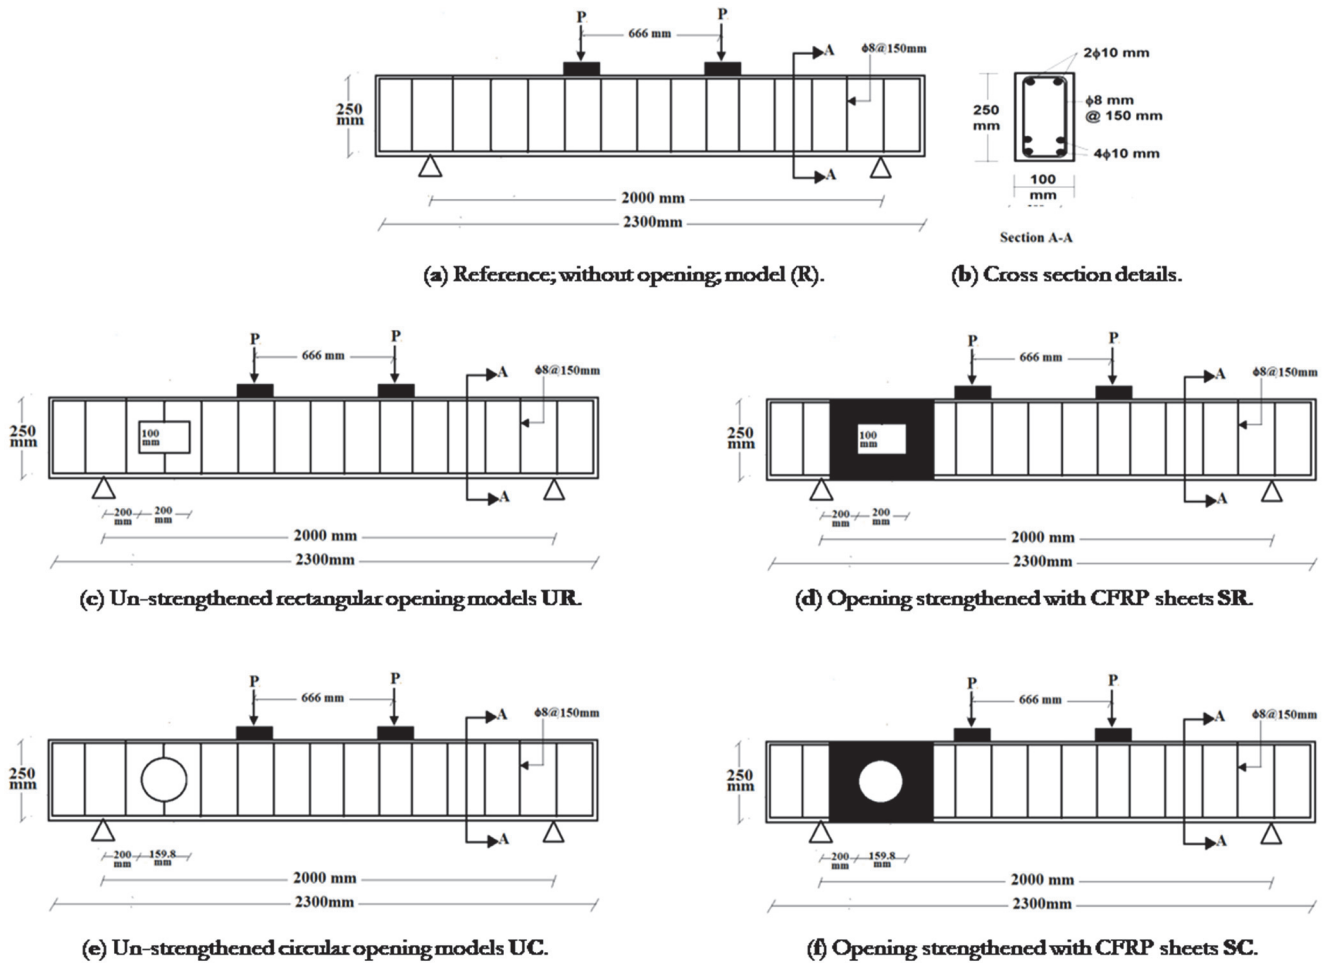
RC beam models dimensions, reinforcements, loading arrangement and the strengthening technique details
